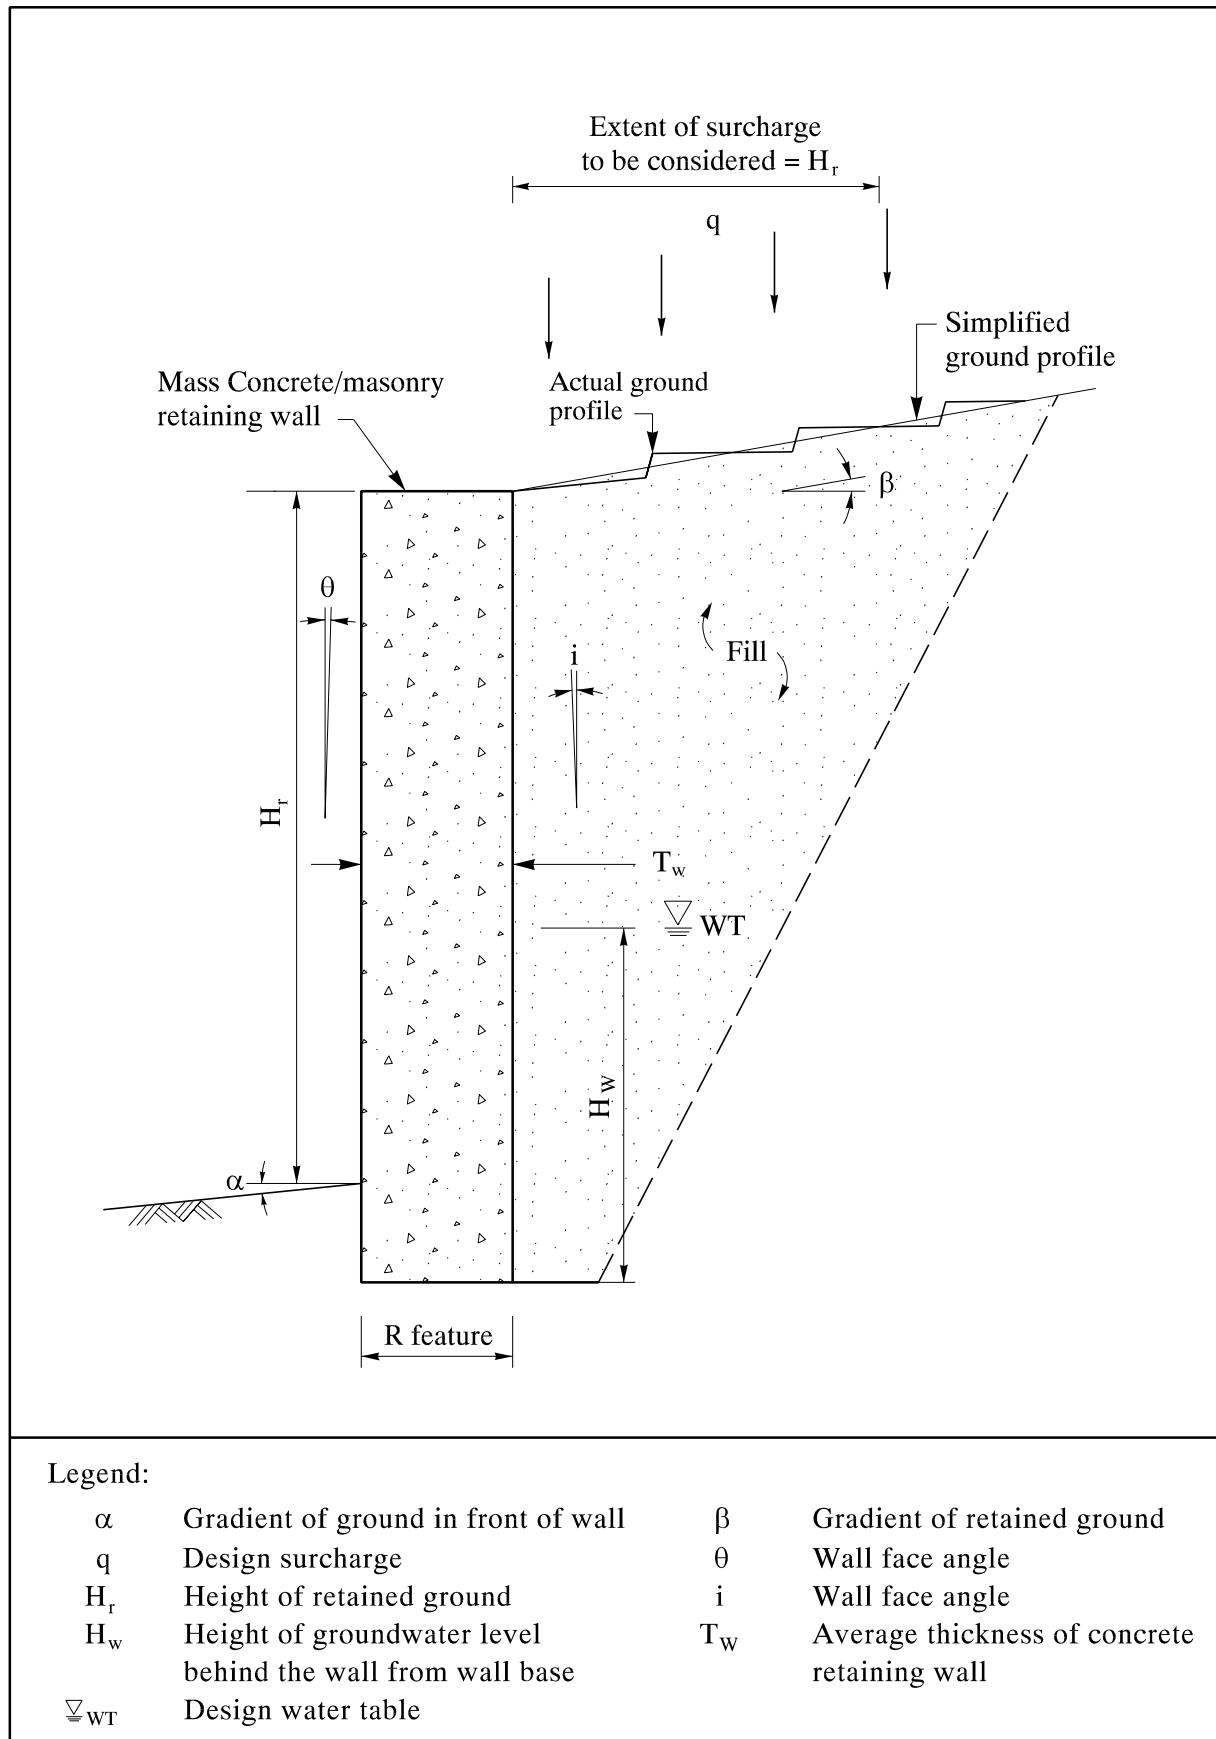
Simplified Geometry of the Ground and the R Feature with Mass Concrete/Masonry Retaining Wall
